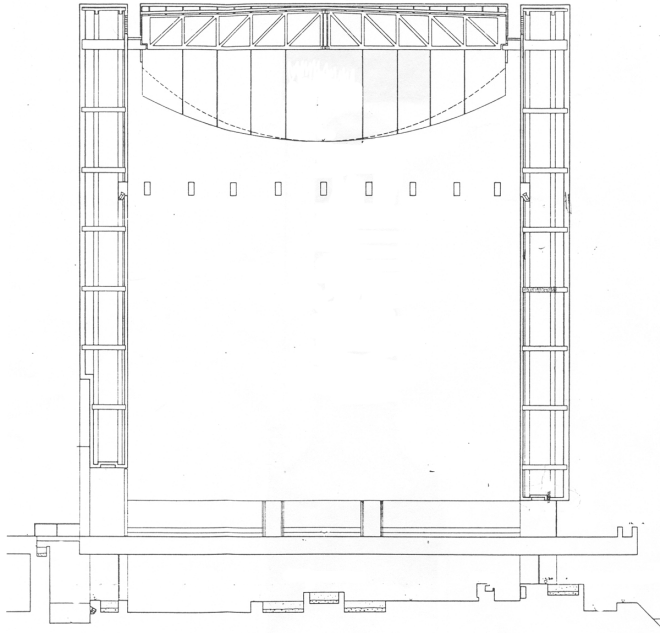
Seville Pavilion, 1992. Cross -section of the main building.
